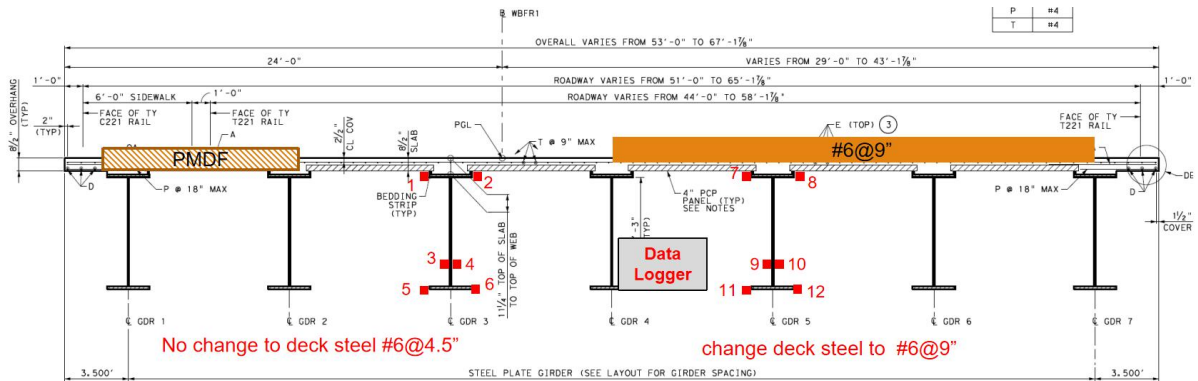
4 Weldable Strain Gages on Steel Girders
